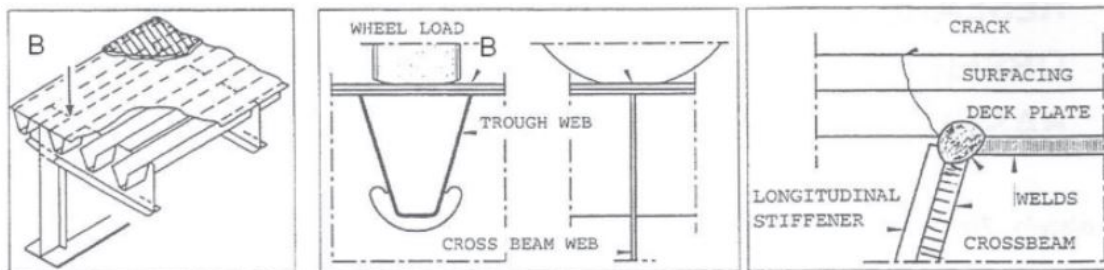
Location of cracks found in the Van Brienoord bridge in 1997: in the deck plate at the connection with the trough, near the intersection of the crossbeam [93].
